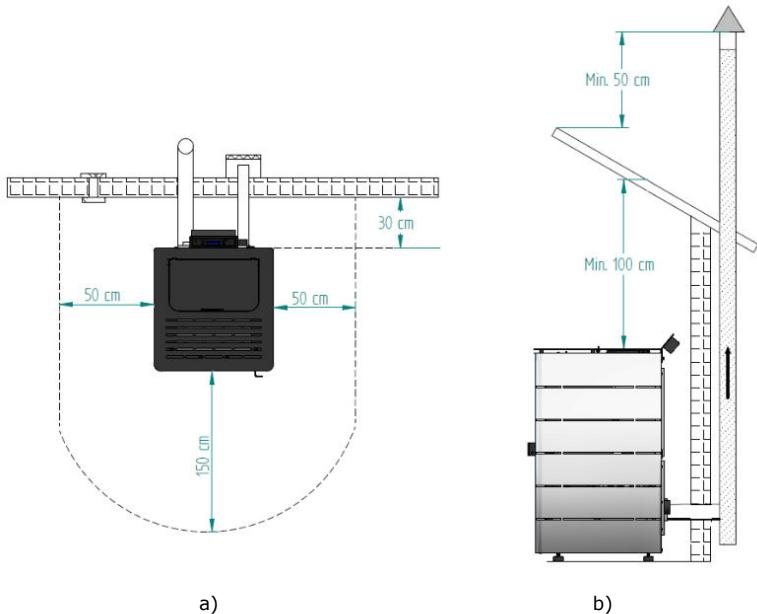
Minimum safety distance around the unit: a) top view of the unit installation; b) side view of the unit installation
